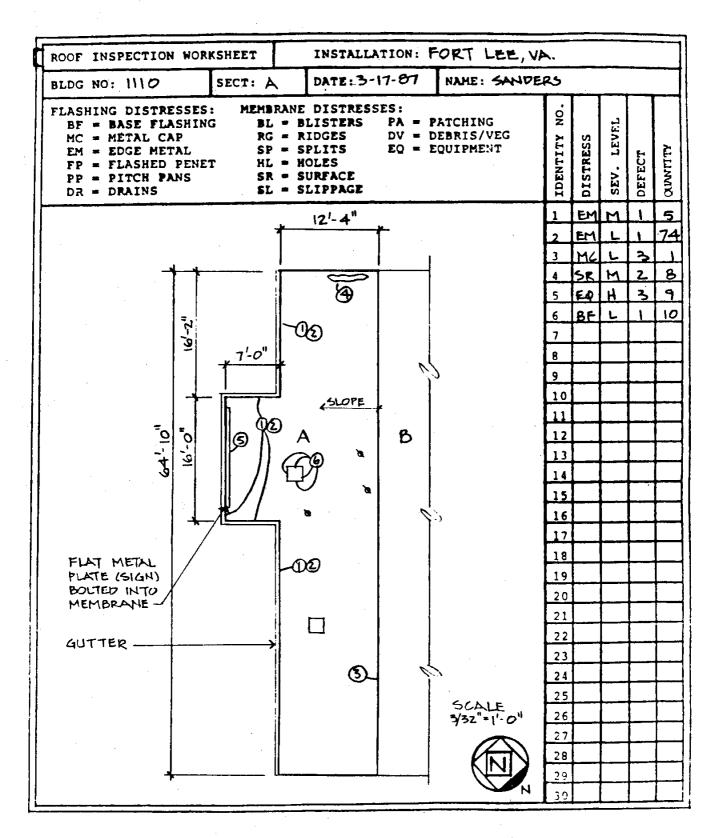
Revised Roof Inspection Worksheet - Fort Lee.
